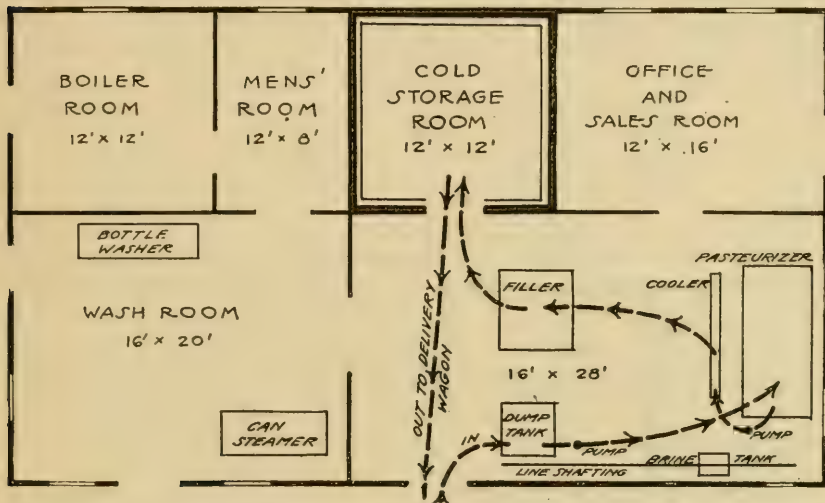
Floor plan for a 1-story plant of about 500 gallons' daily capacity, showing course of milk through plant.
